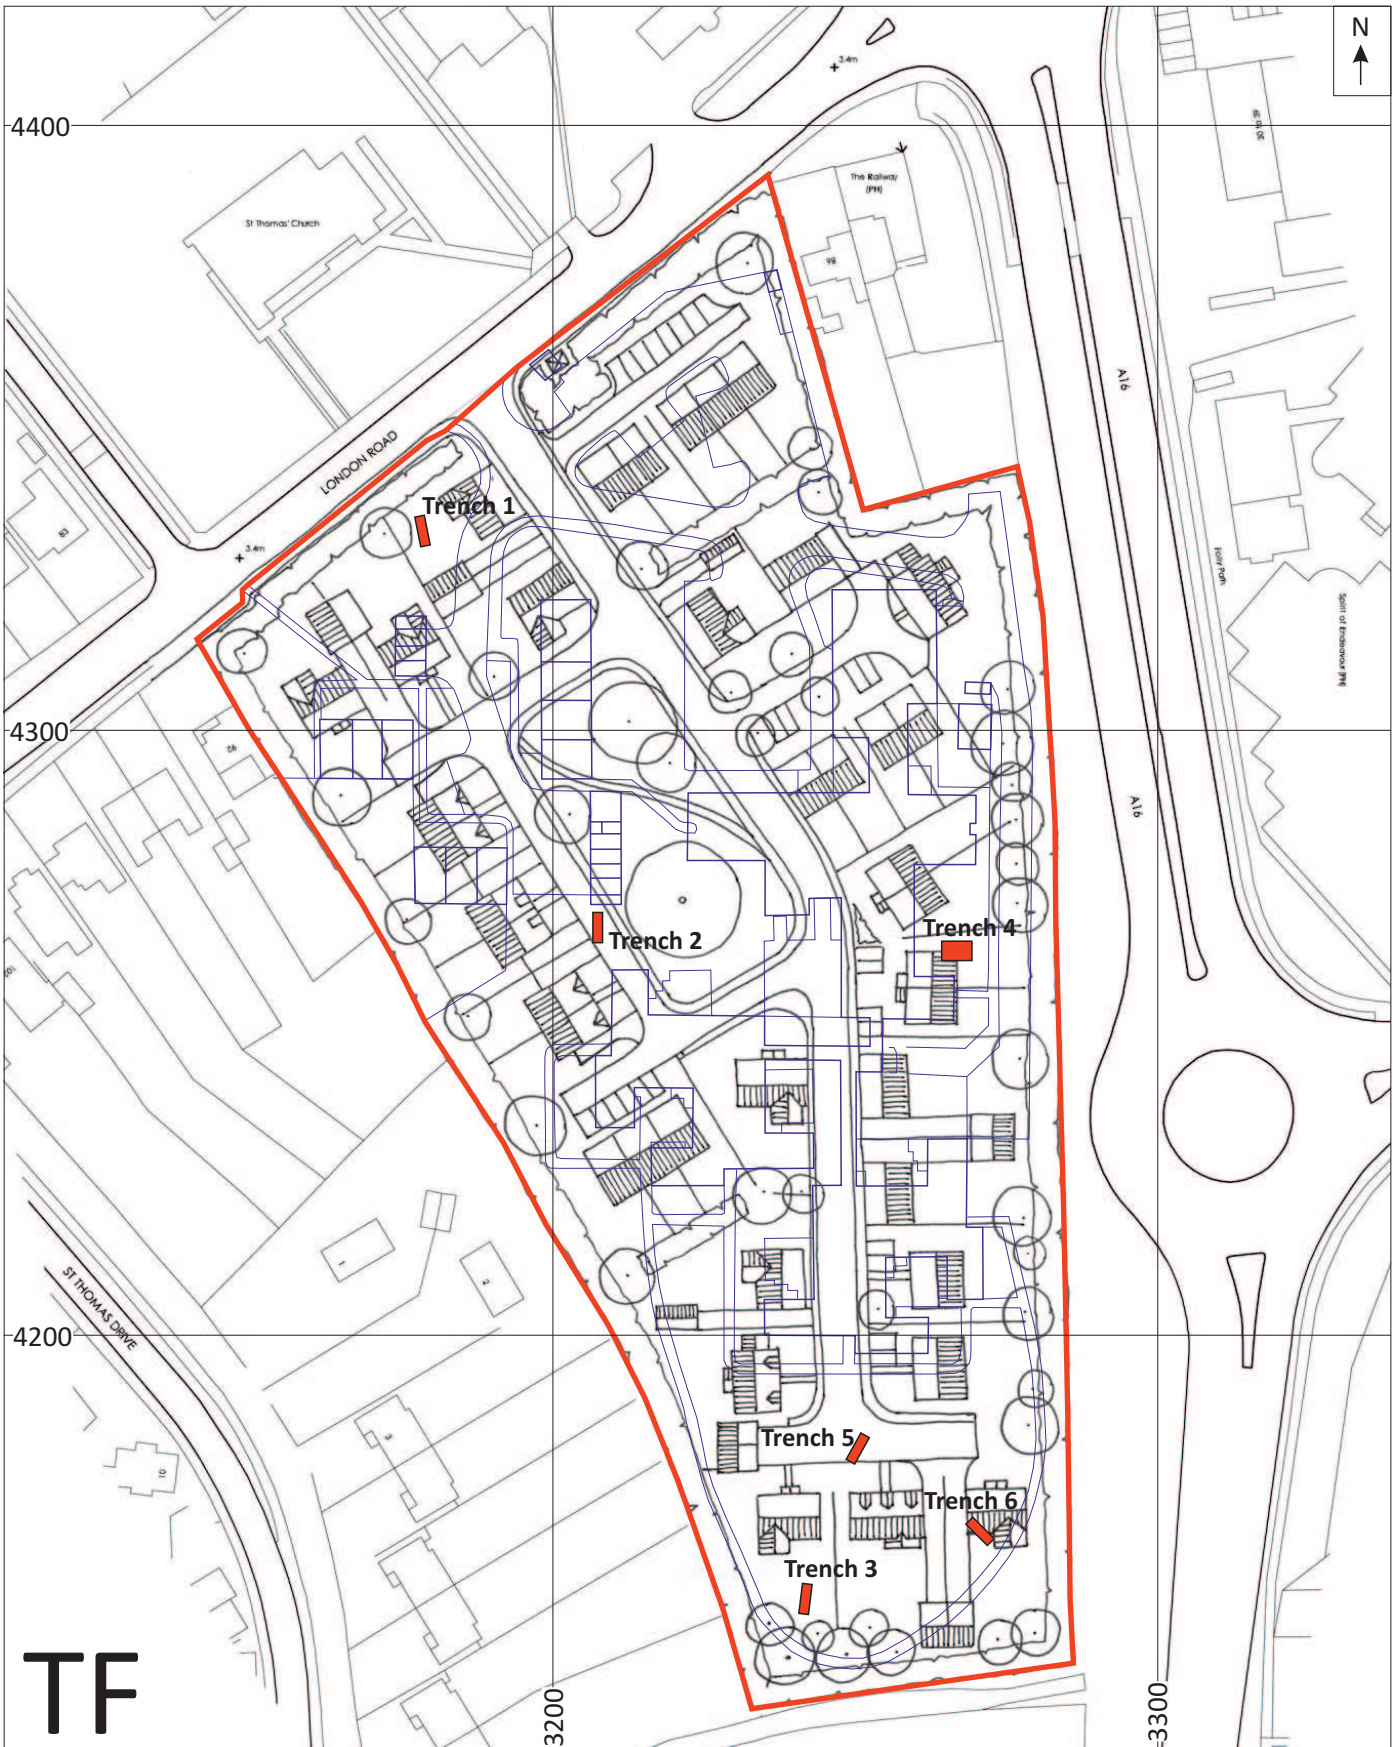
Site plan at scale 1:1250, showing proposed development with existing site layout superimposed in blue. Evaluation trenches and site boundary in red
